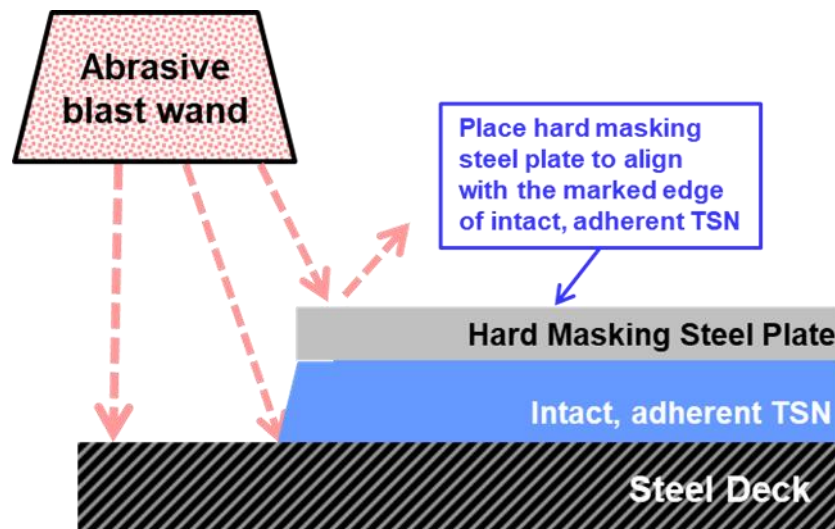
Cross section view of masking alignment for abrasive blasting after HP WJ removal
